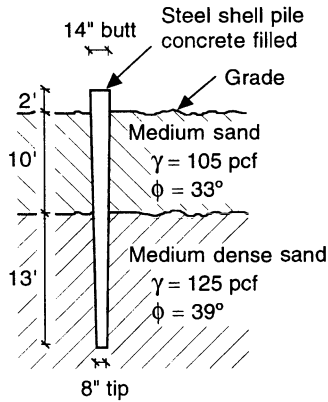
Example 8-5—Steel shell pile in sand.
